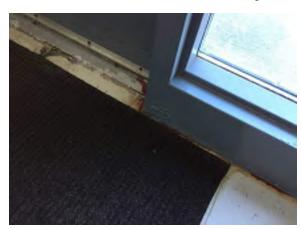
Signs of water at hollow metal door framing entryways adjacent music rooms.
